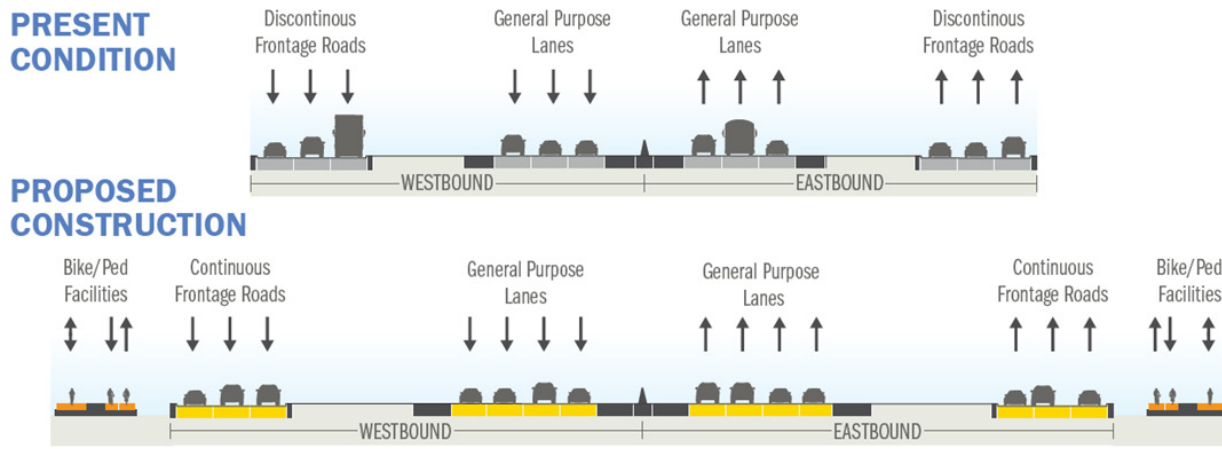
Current and Proposed Typical Sections of Downtown I-10
